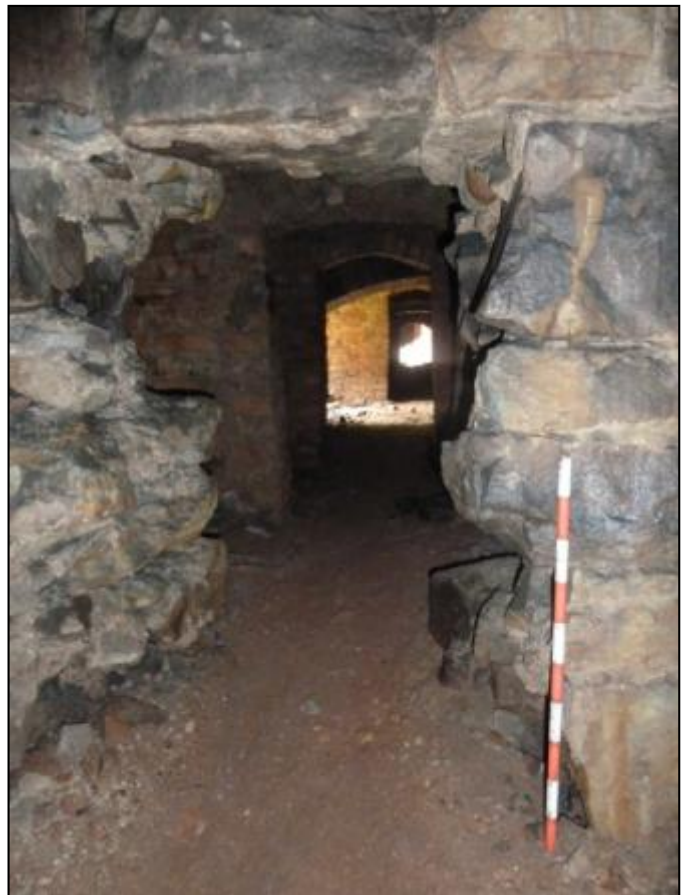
View of Room C11 looking south at a brick archway and what appears to be an inserted iron beam on the right.
